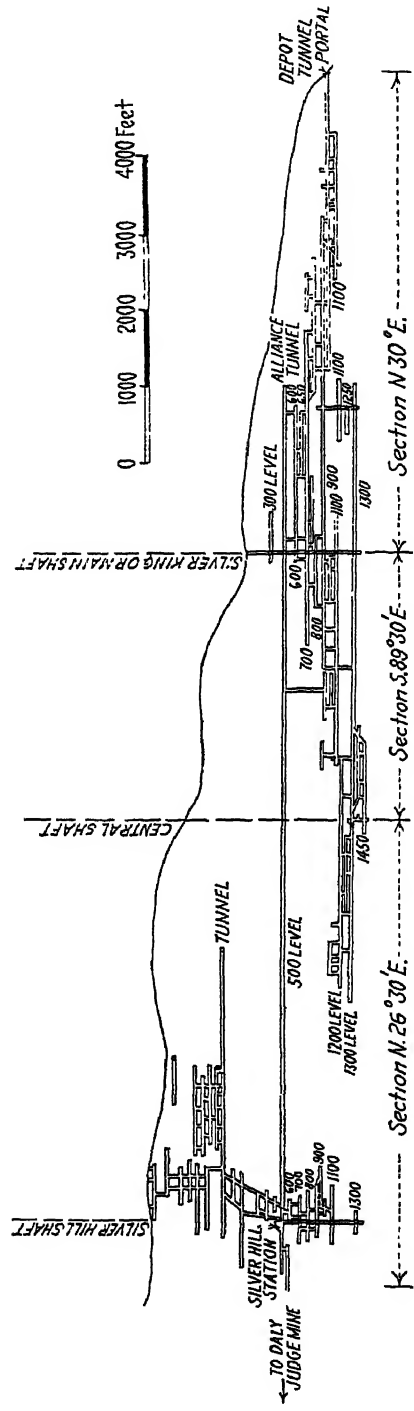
LONGITUDINAL SECTION OF WORKINGS OF SILVER KING COALITION MINE.
